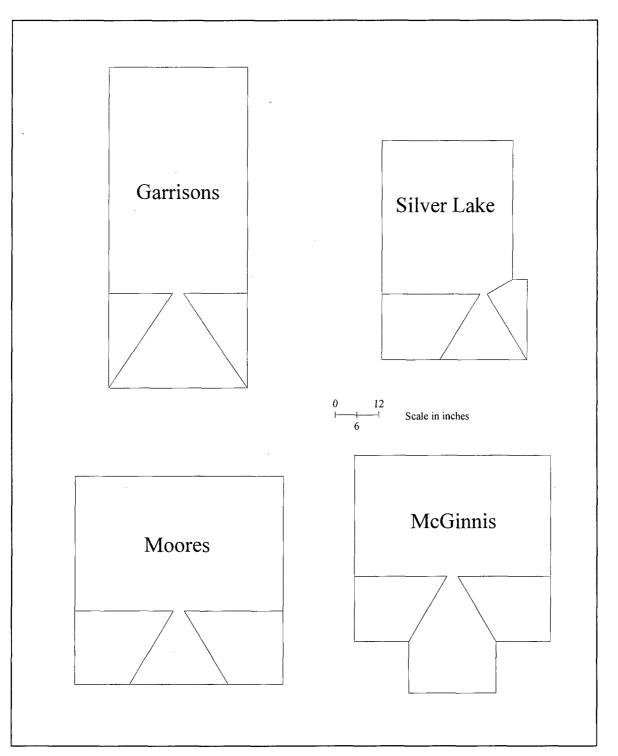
Plan views of four fish traps used to collect fish at the exit (upper end) of the fish ladders.
